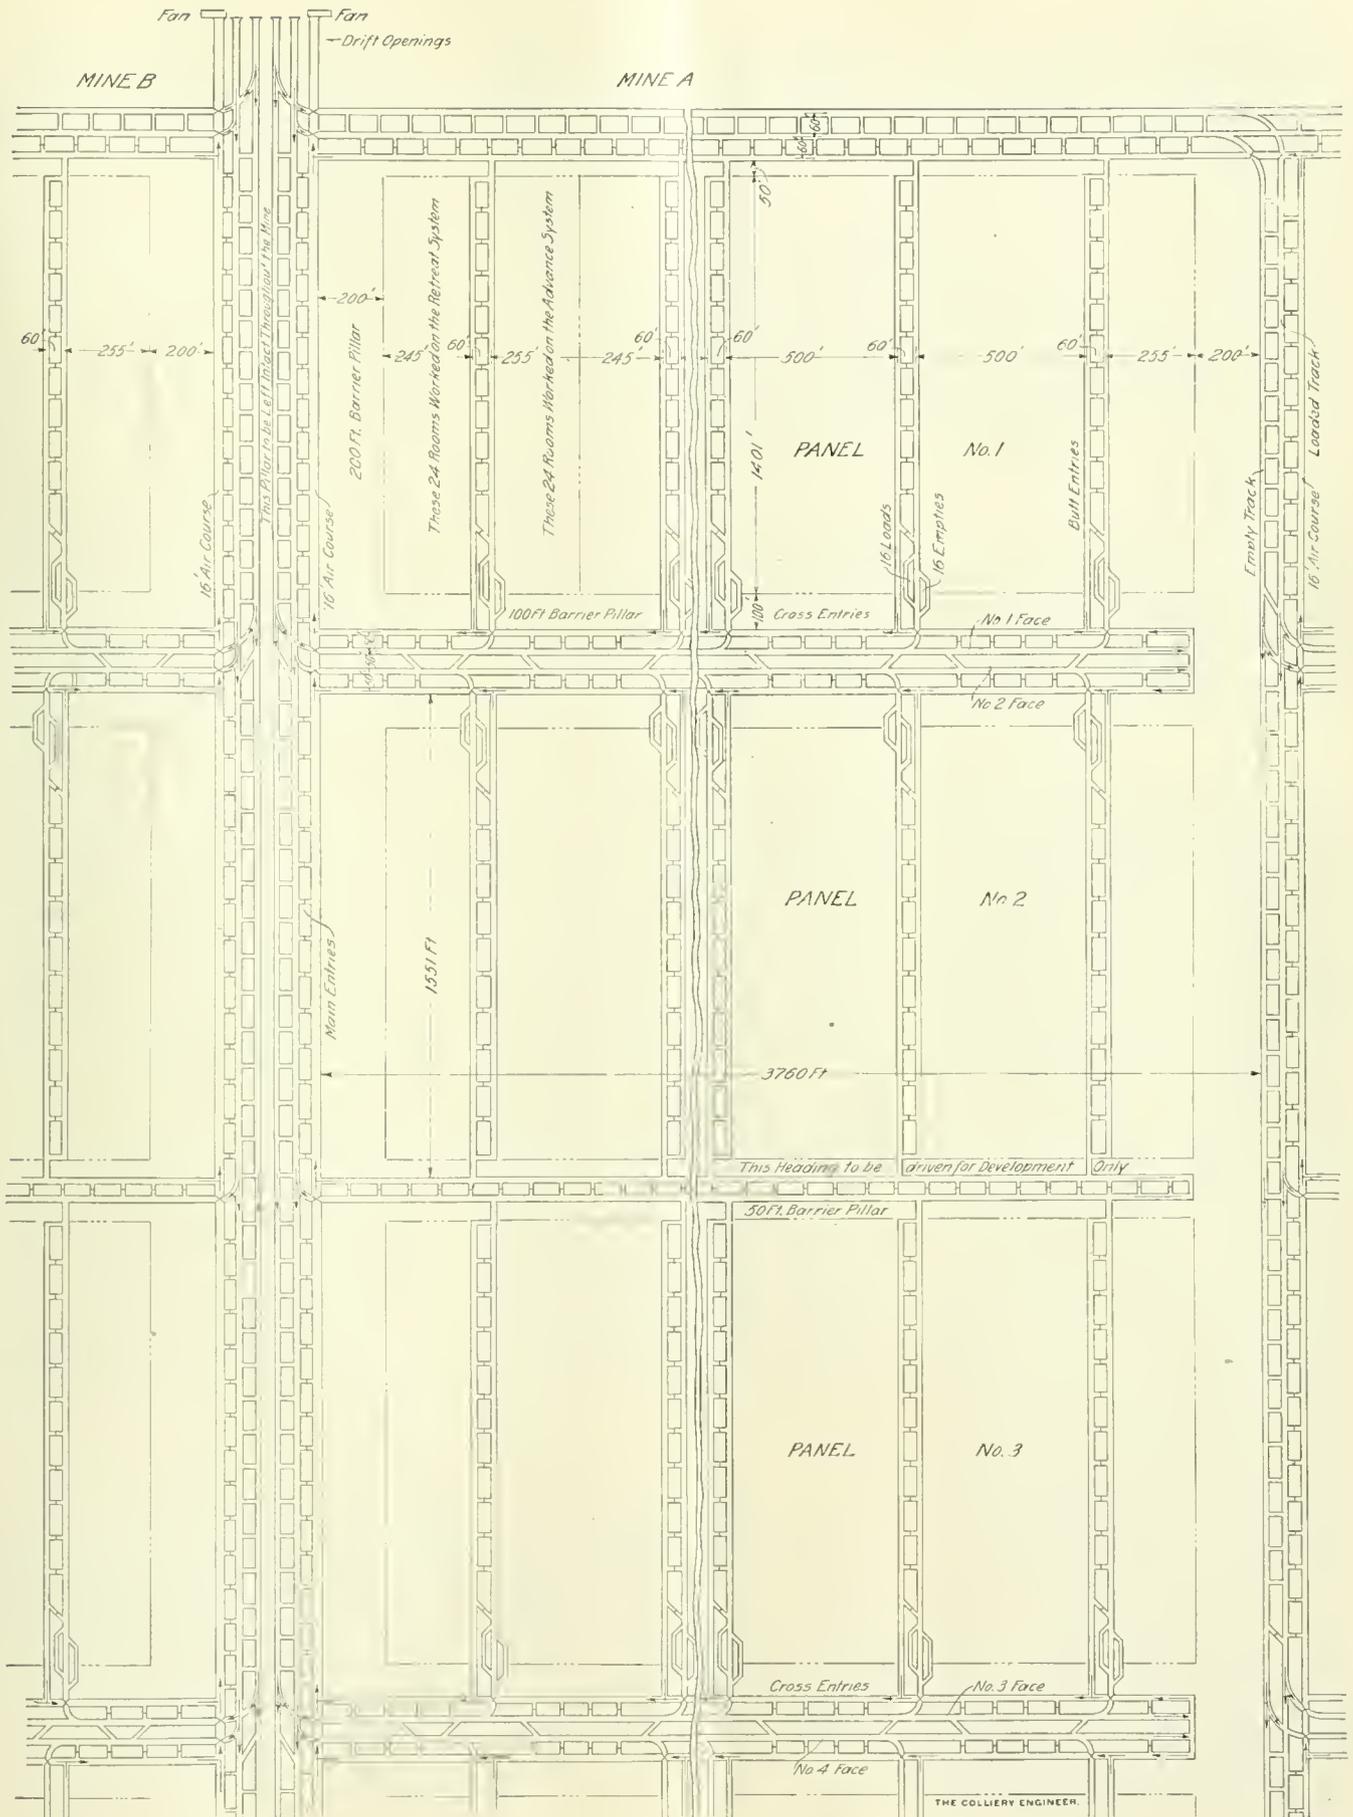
PLAN OF PANEL SYSTEM OF MINING
